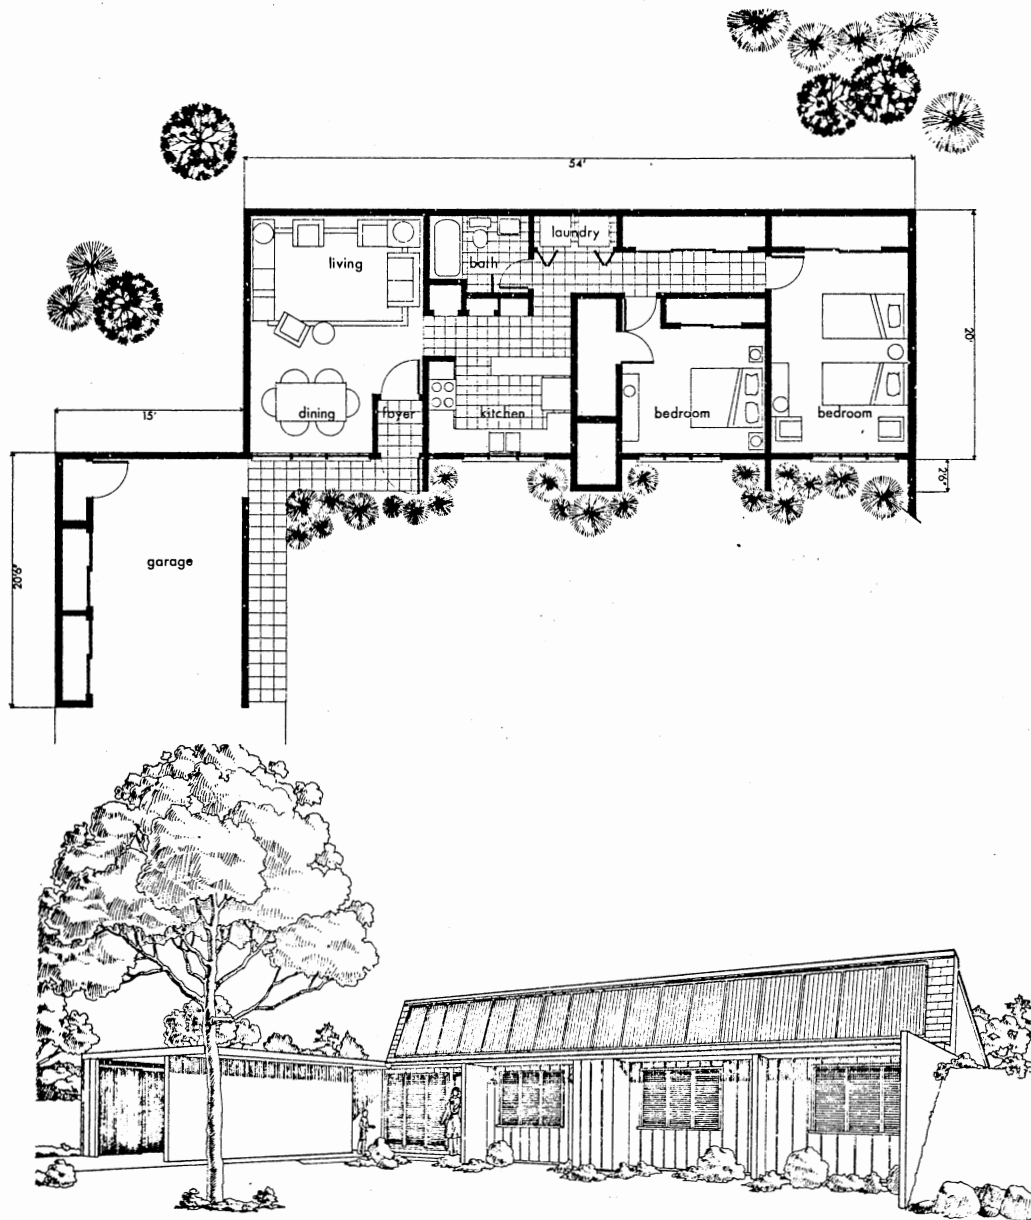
Floorplan and Perspective of the Earth-Insulated Solar House
